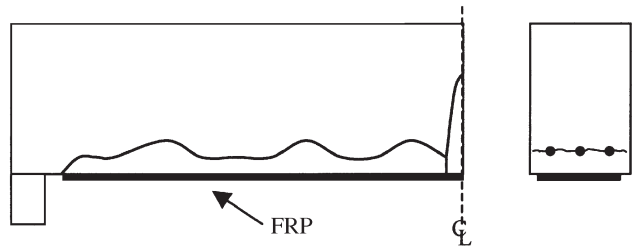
Delamination caused by tension failure of the concrete cover.
